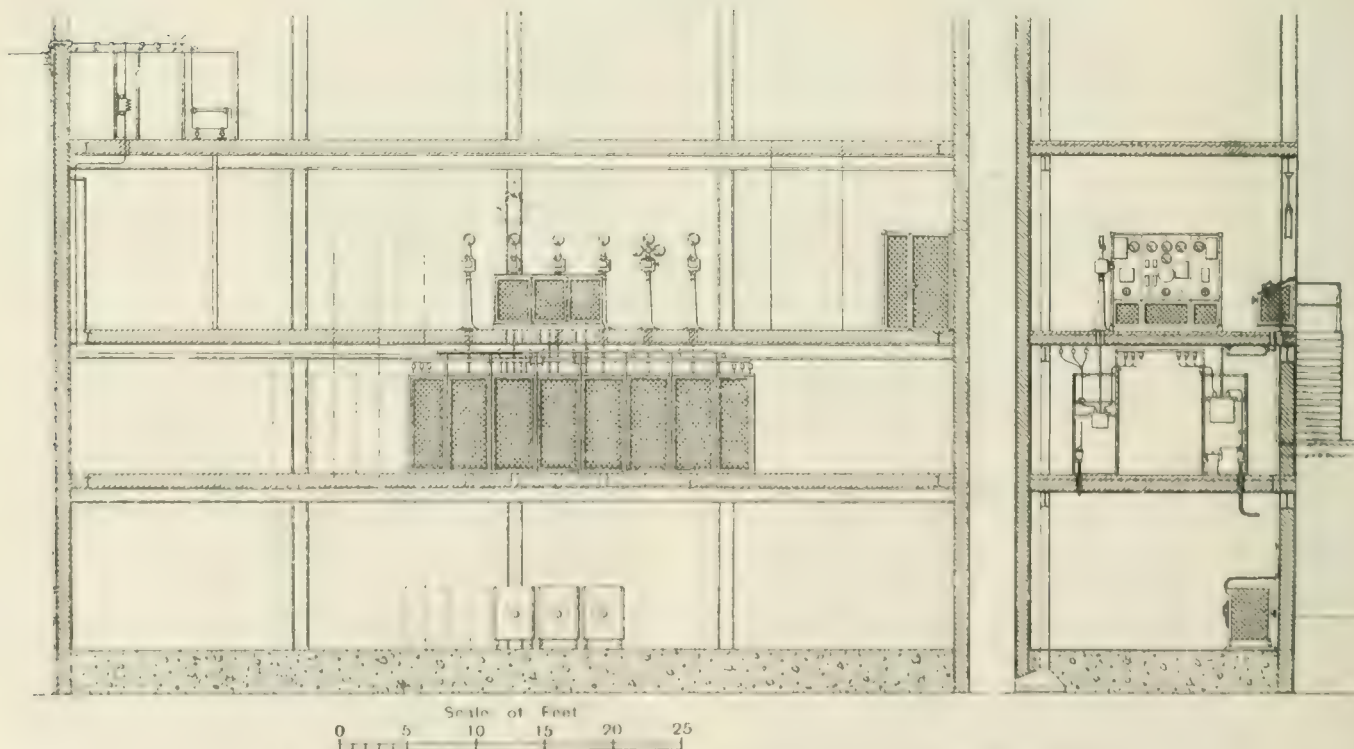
FRONT AND END ELEVATIONS OF H. I. SWITCHGEAR IN MAIN POWER STATION.
